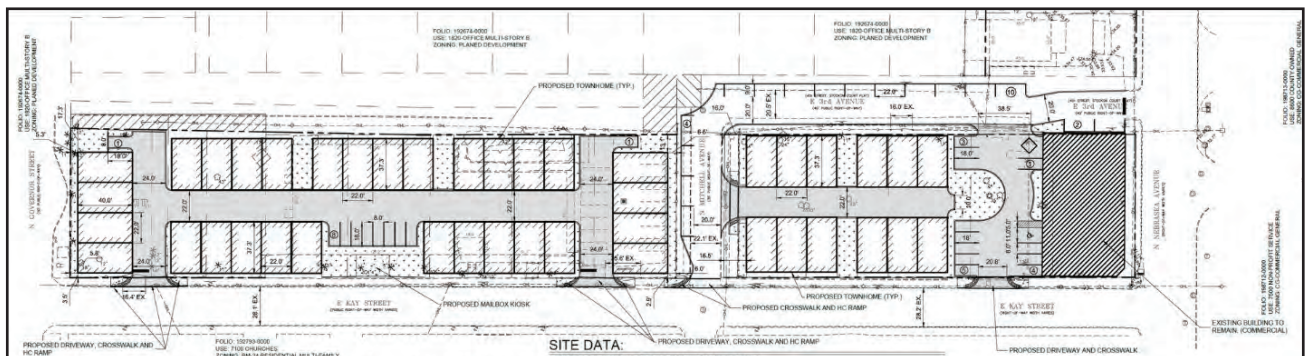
CANVAS GWX TOWNHOUSE DEVELOPMENT PLAN
